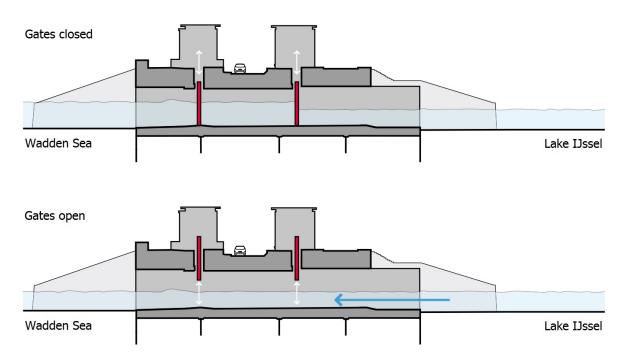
Cross section of an outlet sluice in closed and open condition.
